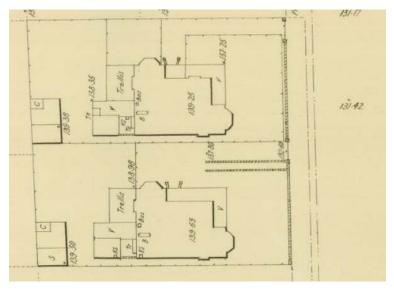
Detail showing matching layout of both blocks; from MMBW Detail Plan c. 1747, dated 1907 (source: SLV).
